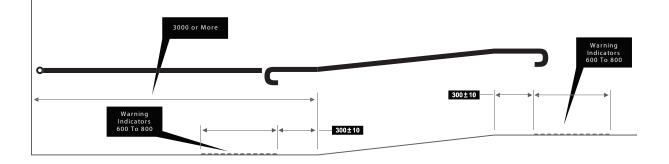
B: Warning Indicators - Ramps. Side elevation where top of ramp leads to an open area and the bottom landing is enclosed, 3000 or more wide and/or handrail is discontinuous
